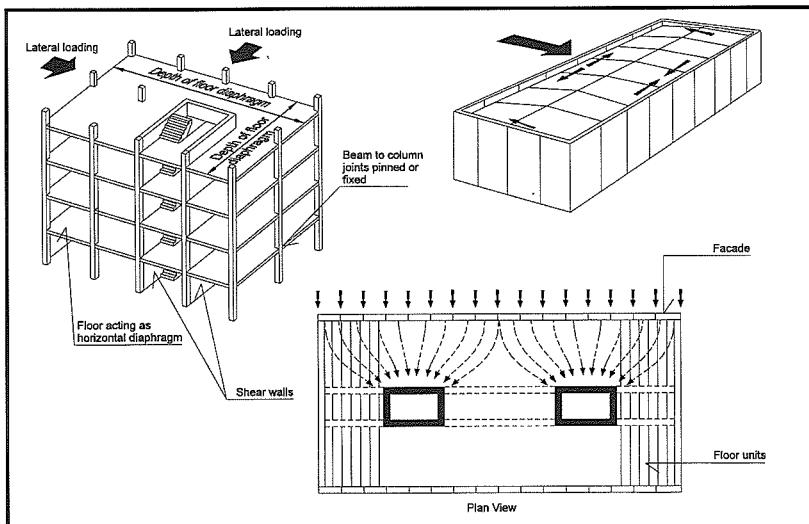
Diaphragm Action In Precast Floors And Roofs (reference 3)
